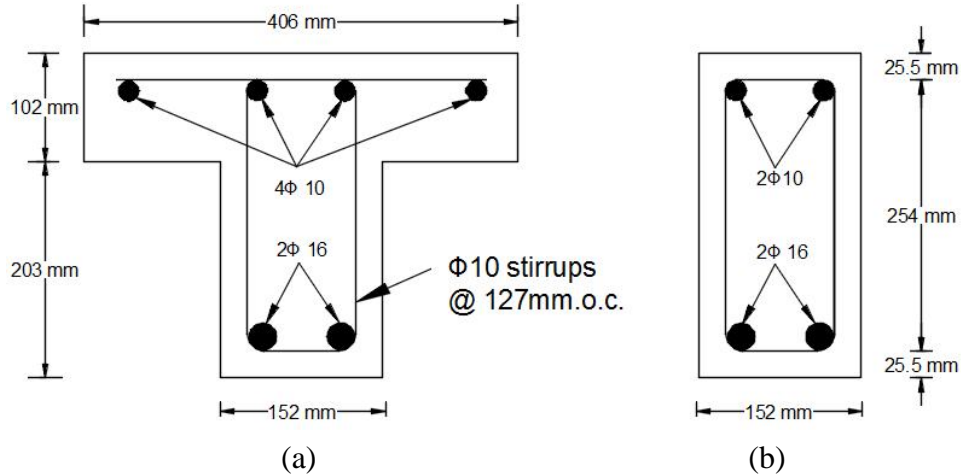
Beam cross section details (a) T-beam; (b) rectangular beam
